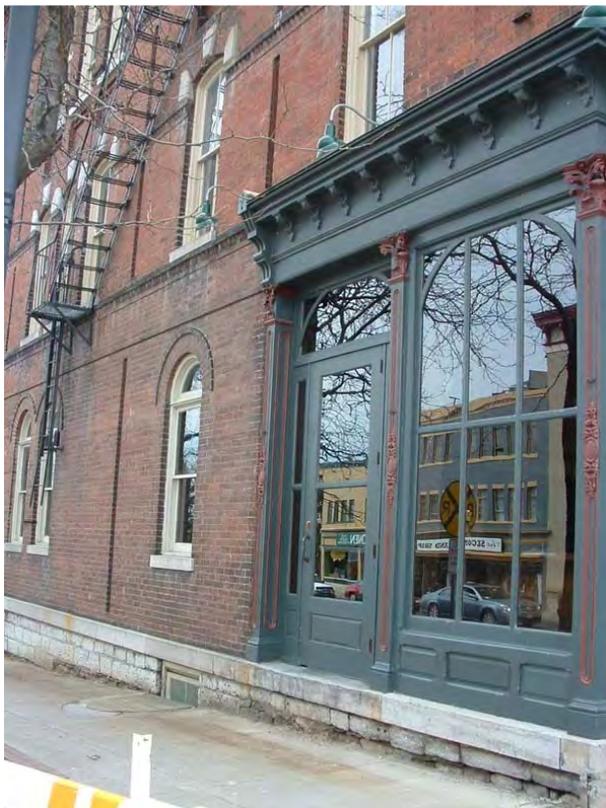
North Façade Storefront replacement door with transom and sidelites
